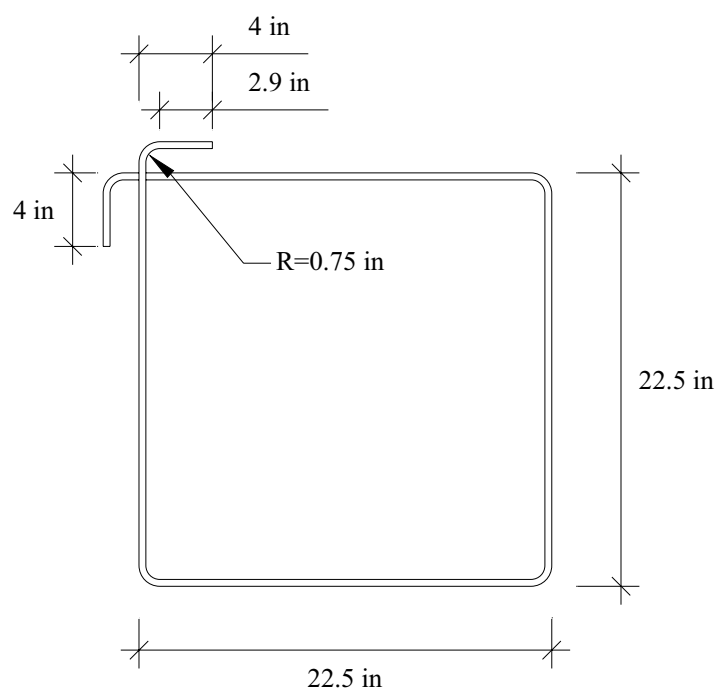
Tie Detail; Specimens D1, D2 & D3
